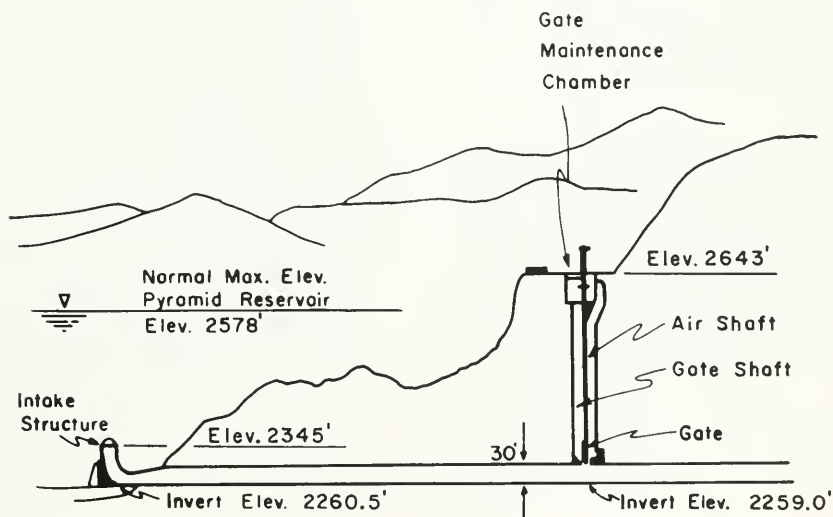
Profile, Intake Structure, and Tunnel Gate Facility
